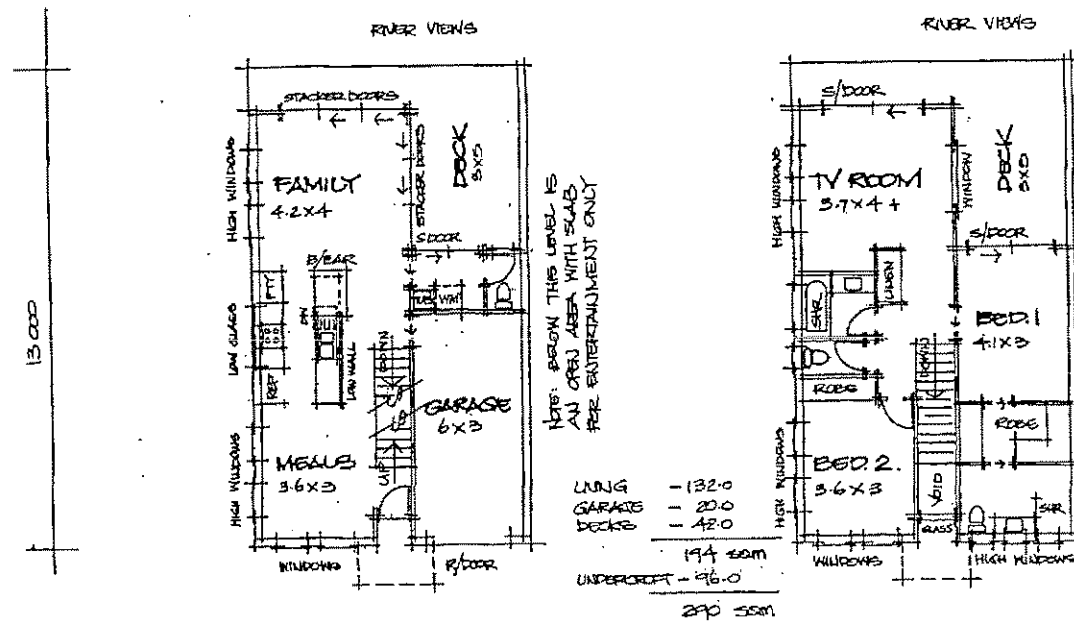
Indicative Floor Layouts *East Coast Building Design & Drafting
